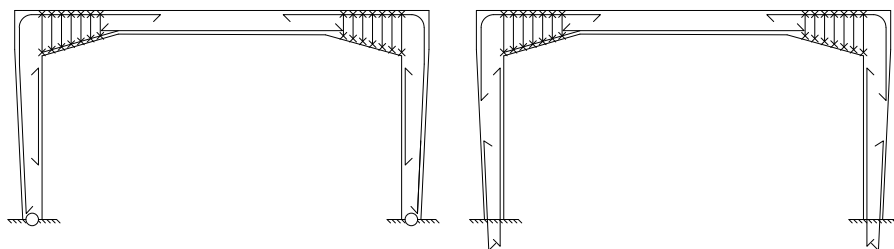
Typical layout of main reinforcement for a slab frame bridge with pinned connections to the foundation (left) and fixed connections to the foundation (right).
